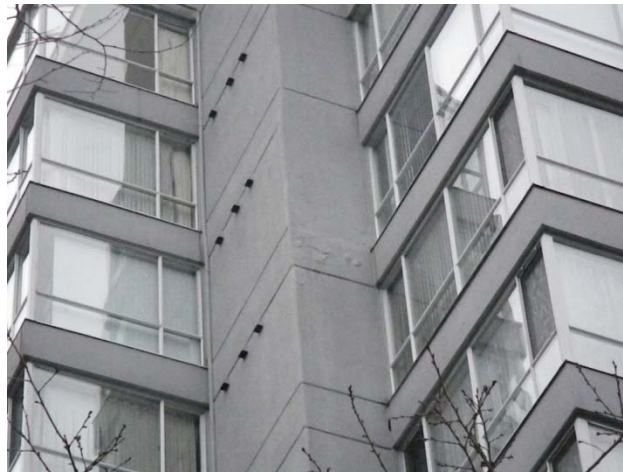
Exposed cast-in-place concrete wall assembly where the concrete is providing the air barrier. (Photo courtesy of RDH.)
